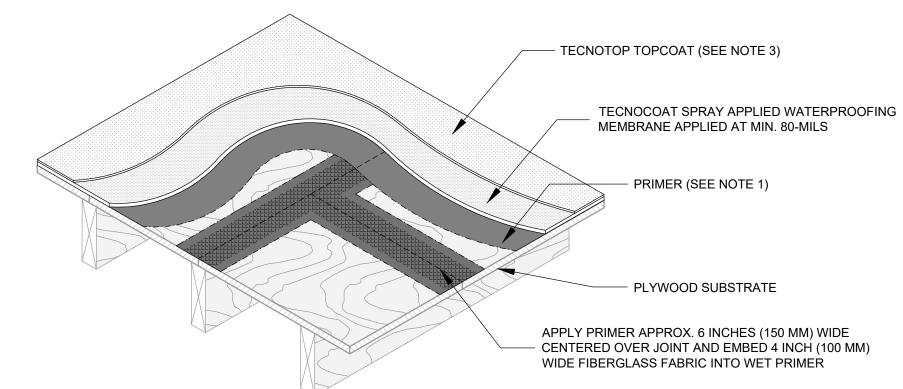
DETAILS ARE INTENDED TO BE A GUIDE FOR WATERPROOFING INSTALLATION ONLY
